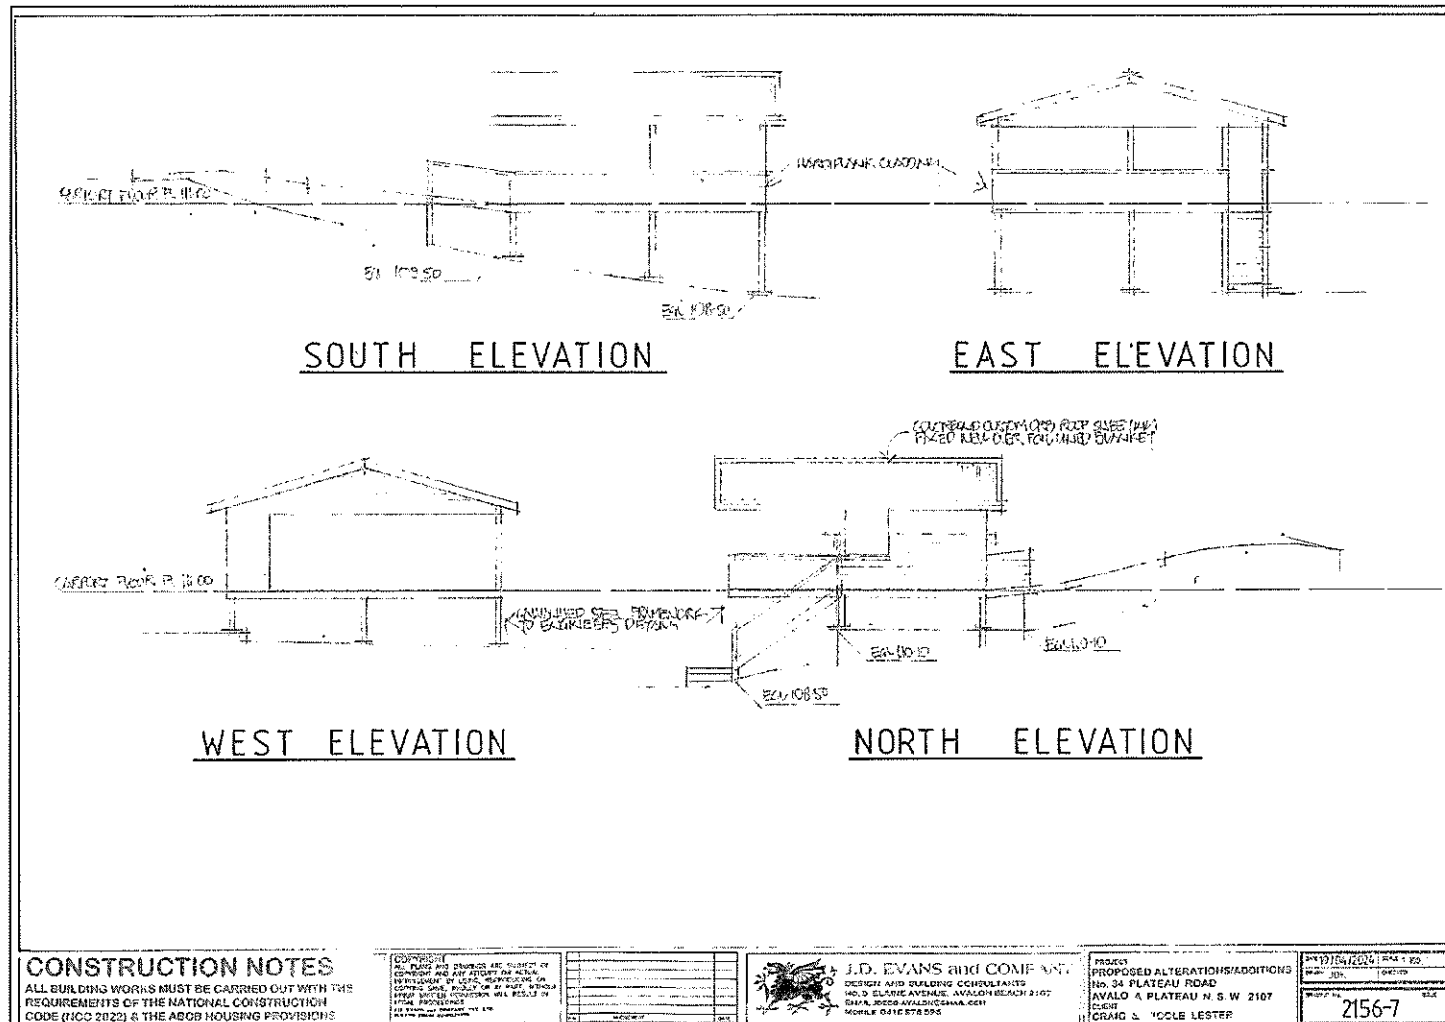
ILLUSTRATES PROPOSED ELEVATION
